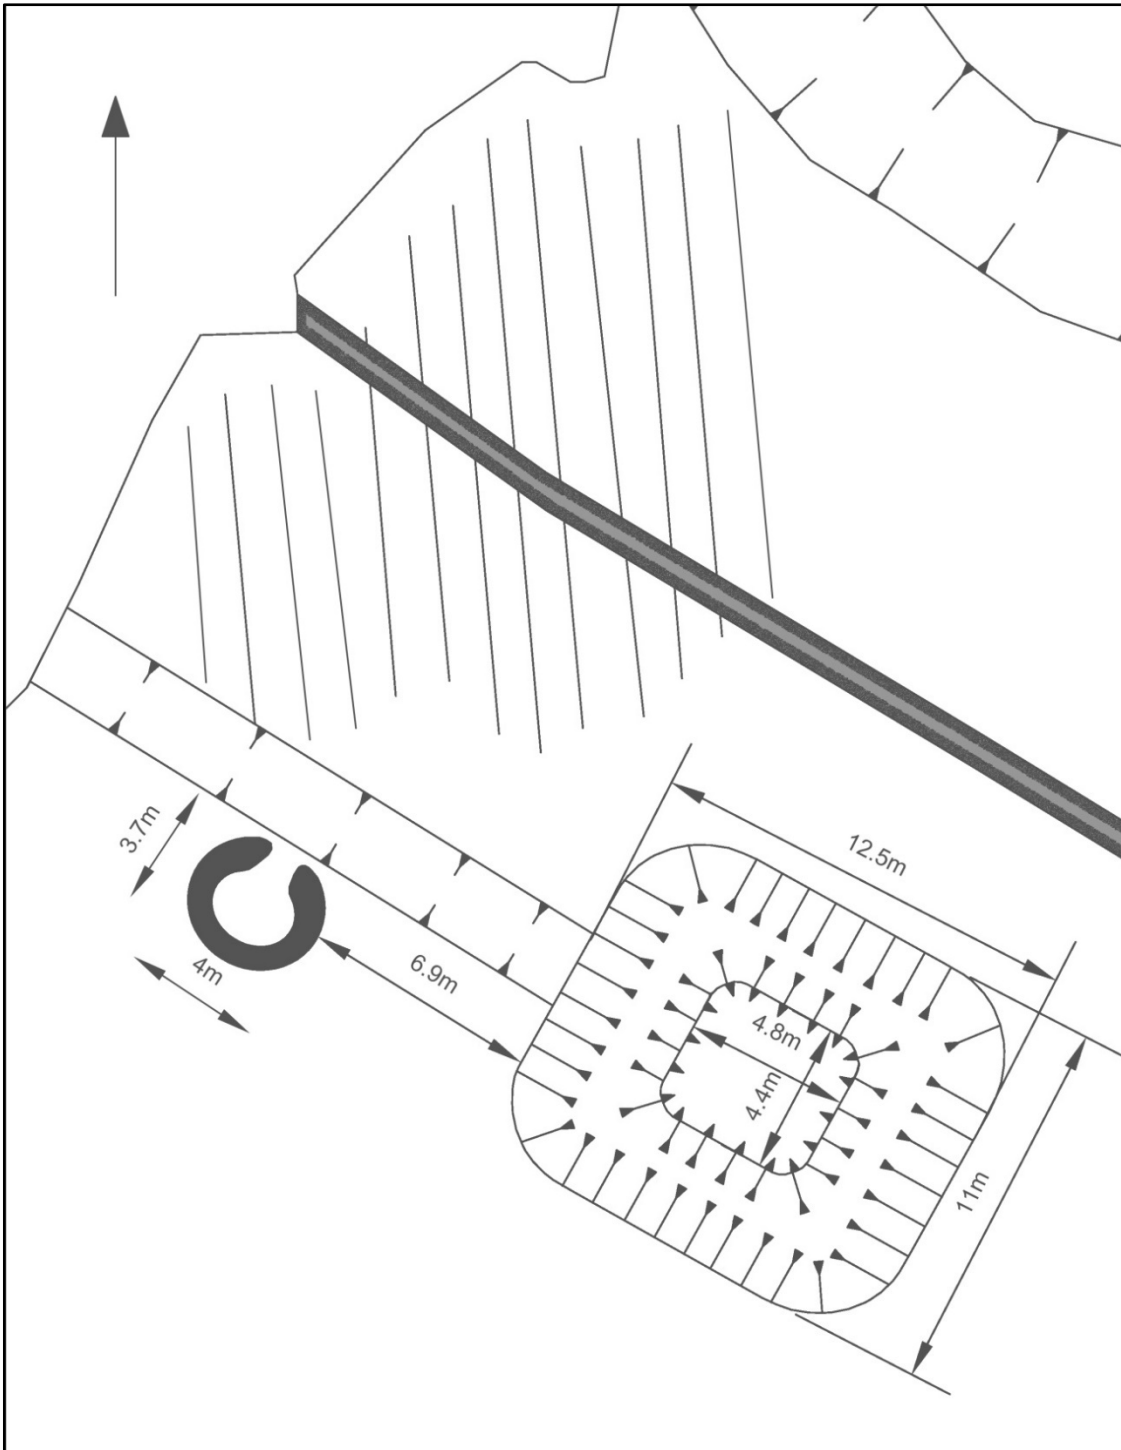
Detailed plan of Killcologue Point Signal Station.
